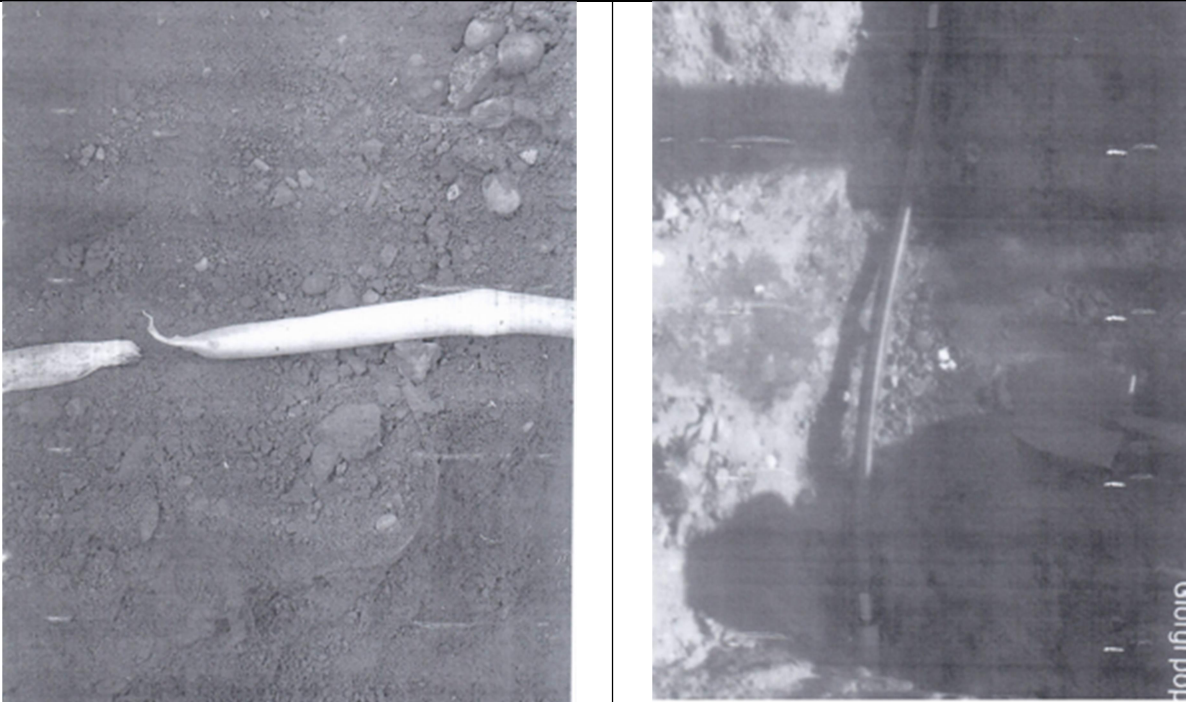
Damaged underground infrastructure (on the left) and the same section after rehabilitation (on the right) – Bukia street
